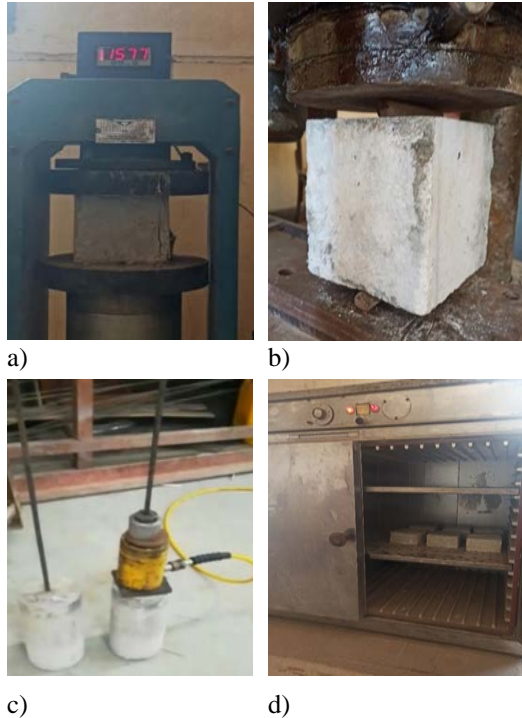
Tests at hardened state a) compressive strength test b) splitting tensile strength test c) Pullout test d) dry specimens in the oven.
